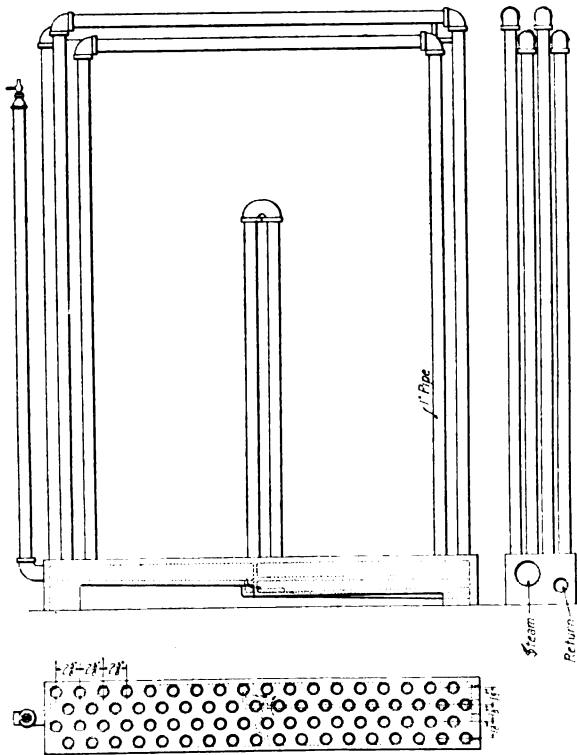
DETAIL OF HEATER CONSTRUCTION
